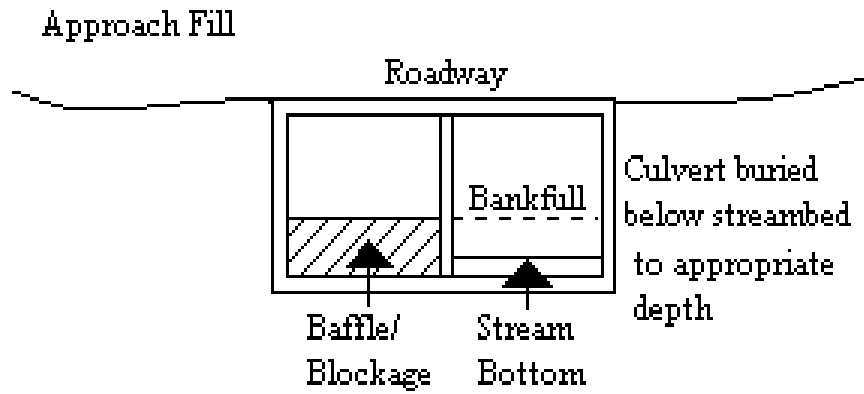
One Culvert carrying bankfull flows, second culvert blocked and will become active when bankfull flows are exceeded.
